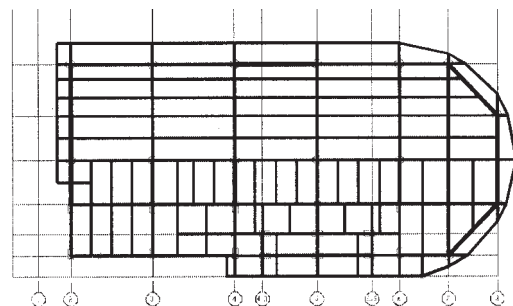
(b). Floor plan for building (courtesy of Professor Dan Dubina).
